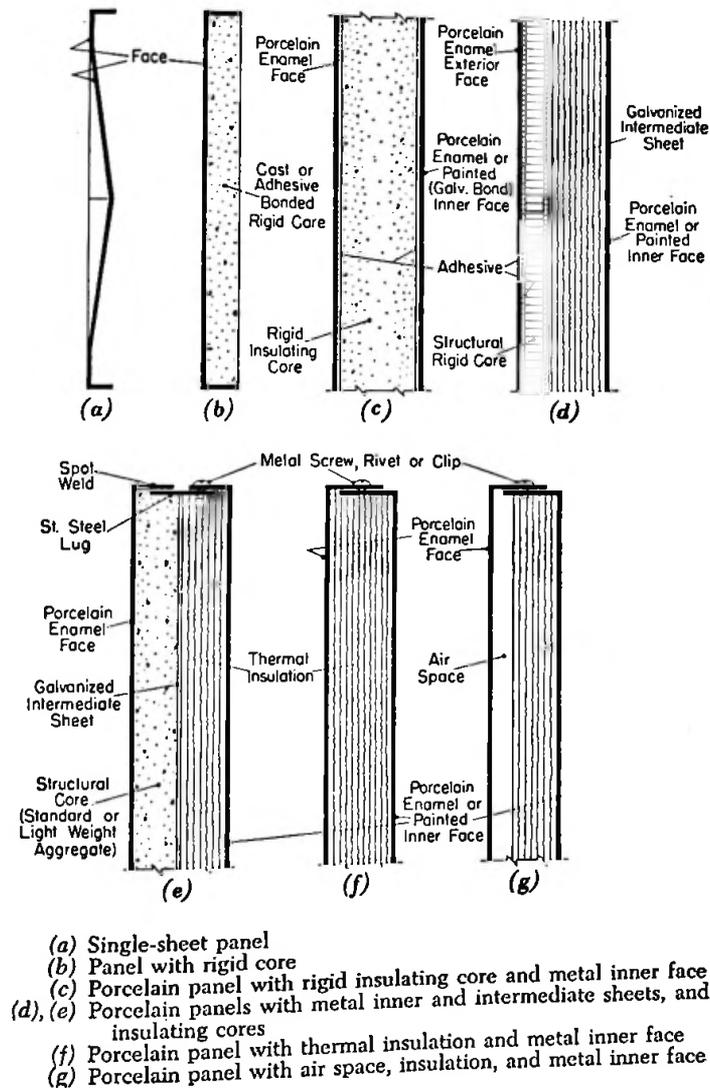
PORCELAIN-ENAMEL WALL AND CEILING COVERING
